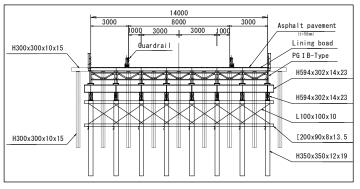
Profile of Detour Road and Temporary Bridge
